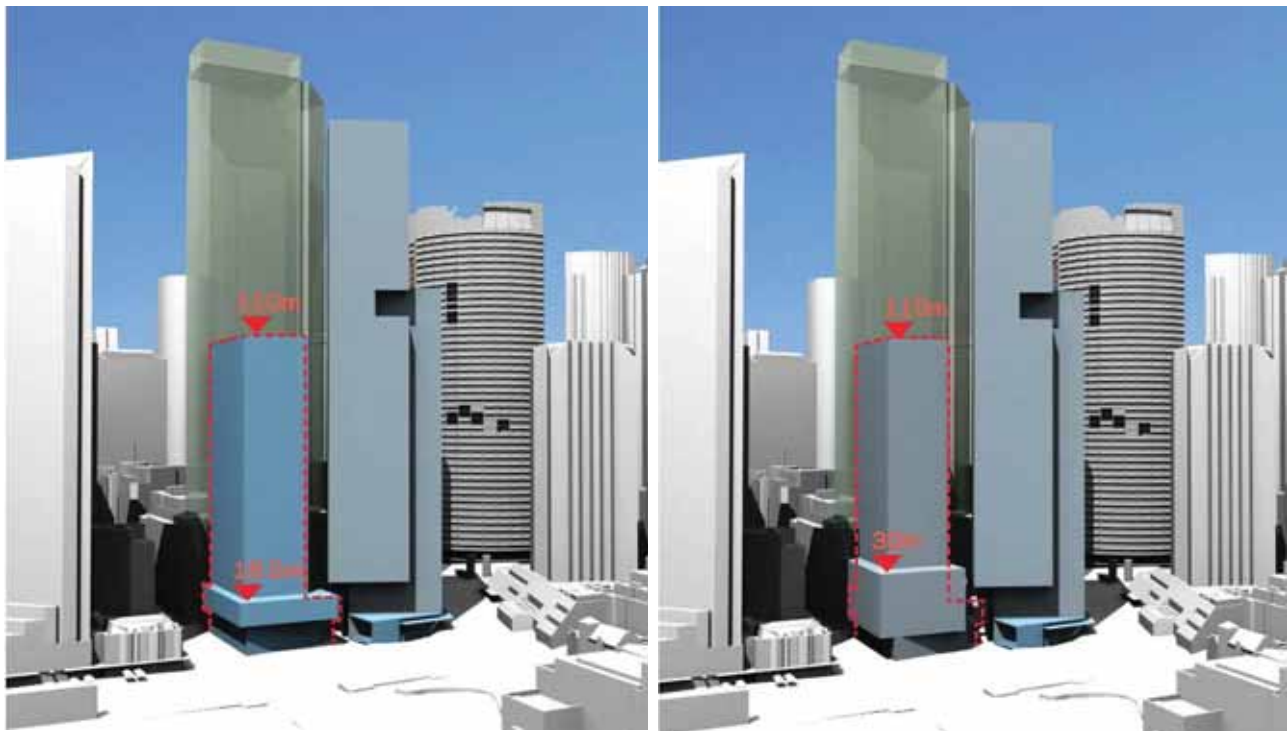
Tower B envelope lodged (left) and revised (right) (Source: Applicant's design study)
